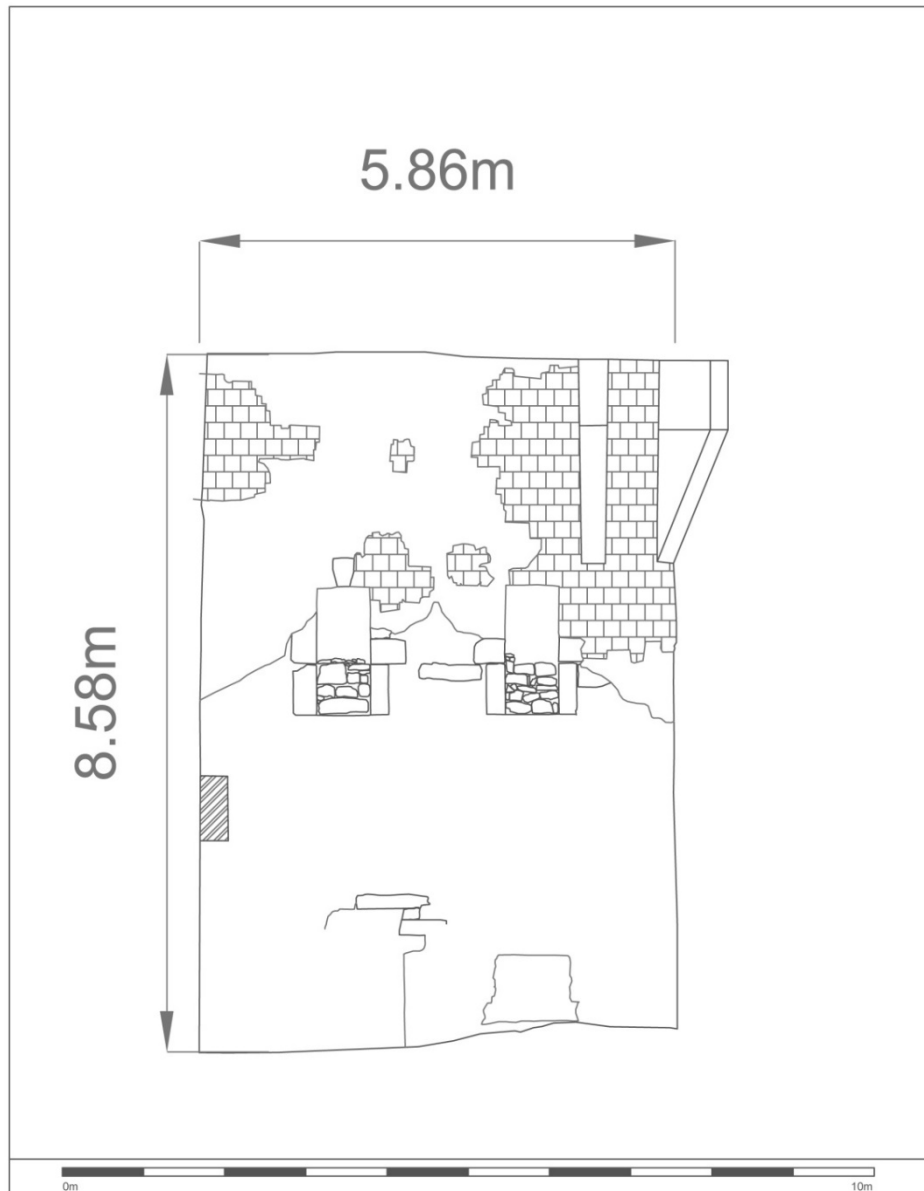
External elevation of the south-east wall of the signal tower at Inishmore Signal Station.
